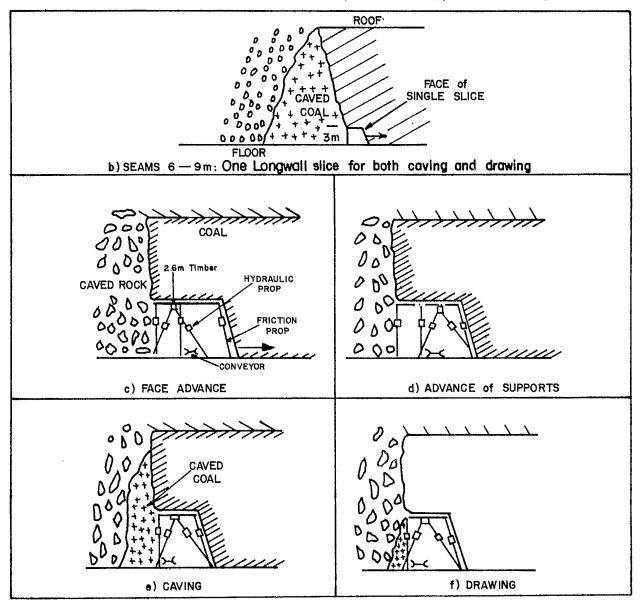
LAYOUT and MINING CYCLE for EARLY CAVING and DRAWING SYSTEMS
